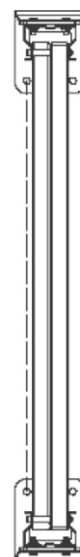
A recommended arrangement of anchors for a single frame. Fig. 32 Arrangement for an outer lane of a series of racks (4 anchors)
